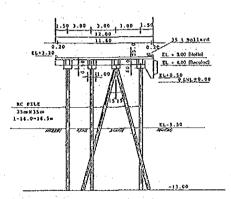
Short Term Ro/Ro Terminal Development Plan at Port of Bacolod
